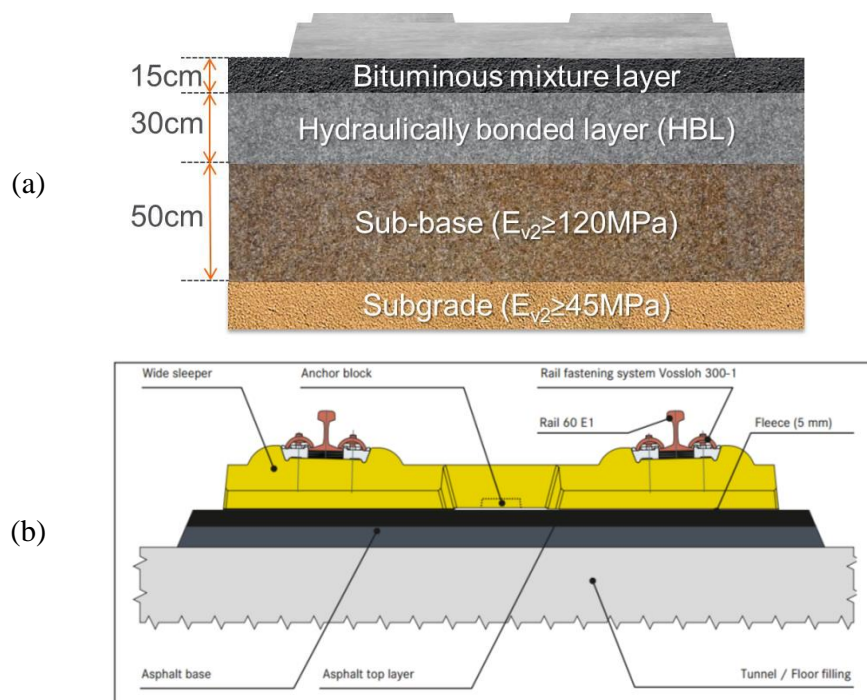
Schematic cross section the GETRAC® A3 ballast-less track with HBL (a) and scheme of the application of GETRAC® system to tunnels (adapted from (Rail.One GmbH, 2012))
